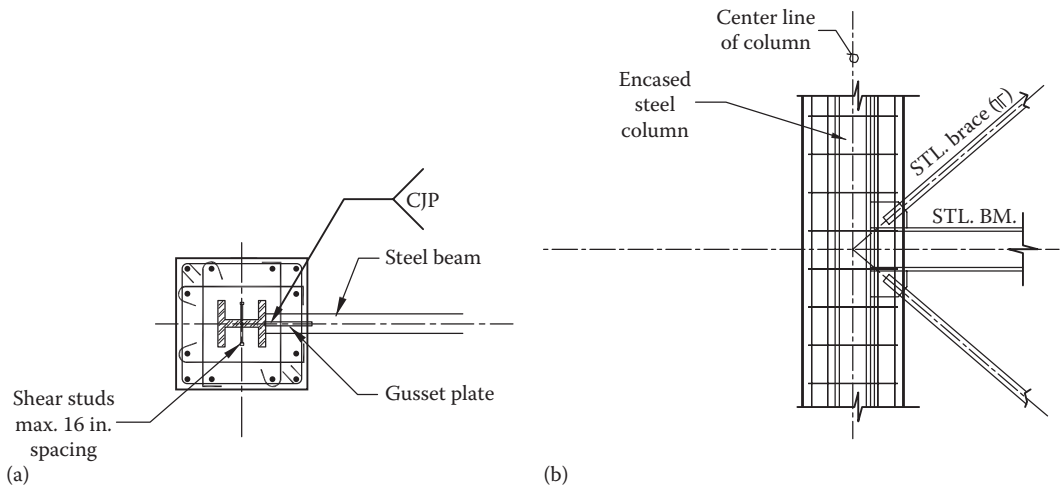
Composite concentric braced frame: Connection schematics; (a) plan; (b) elevation.
